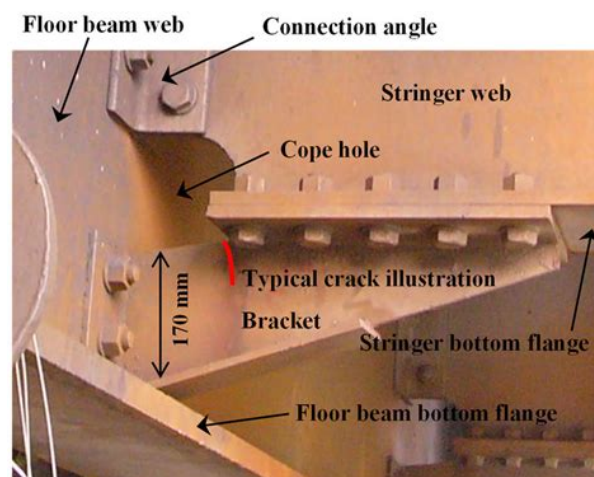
Typical Floor-to-Stringer beam connection found in a steel bridge.
